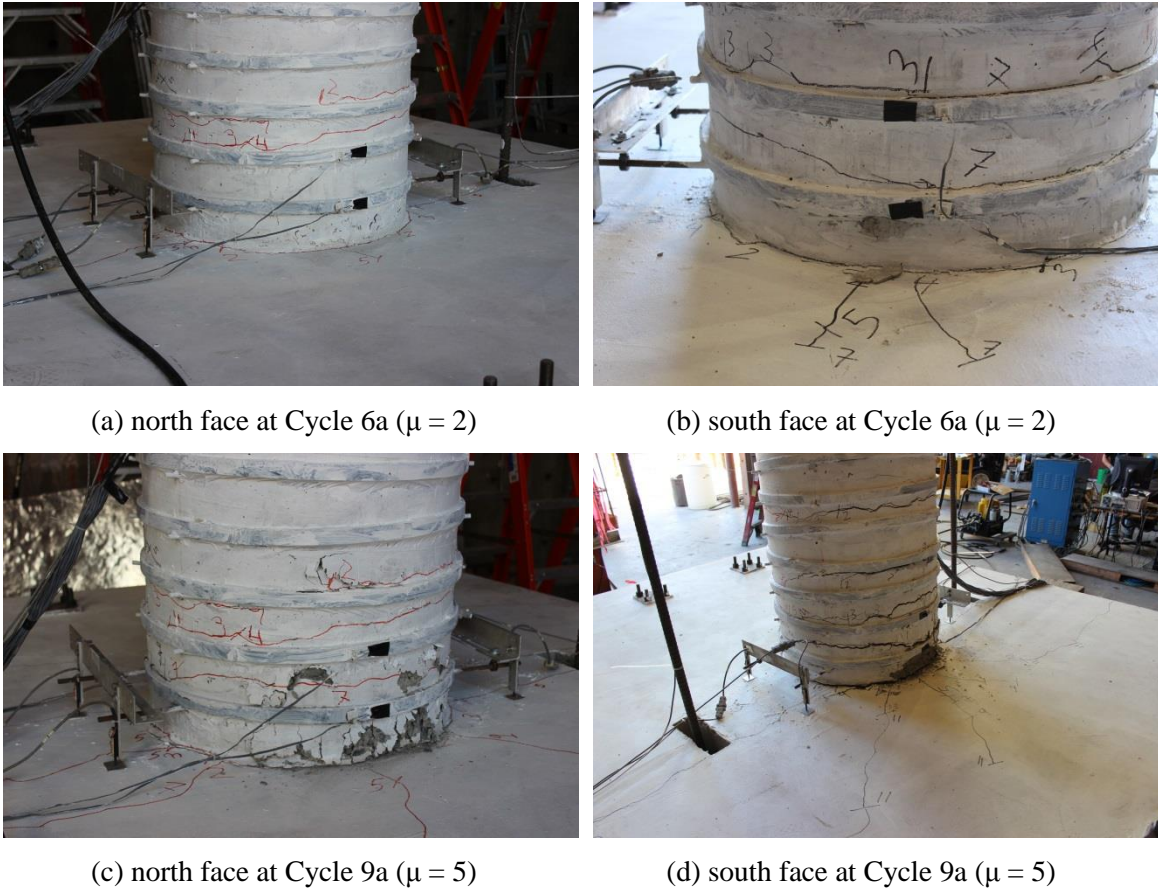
Evolution of damage at the bottom of the column of Specimen #1
